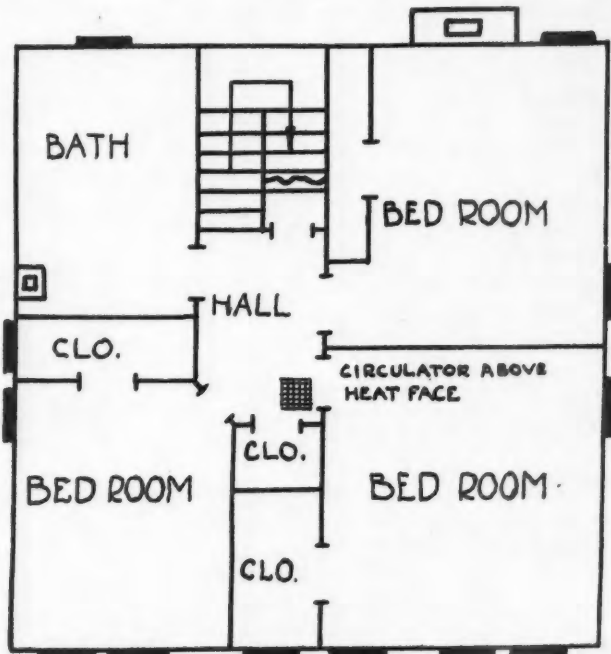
Second Floor Plan to Show the Proper Location of a Second Floor Register, or Circulator, in a Pipeless Heating System.
